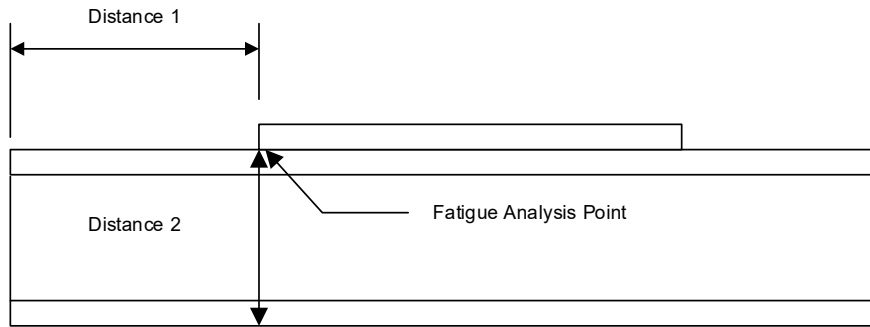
Fillet Weld at Top Cover Plate
